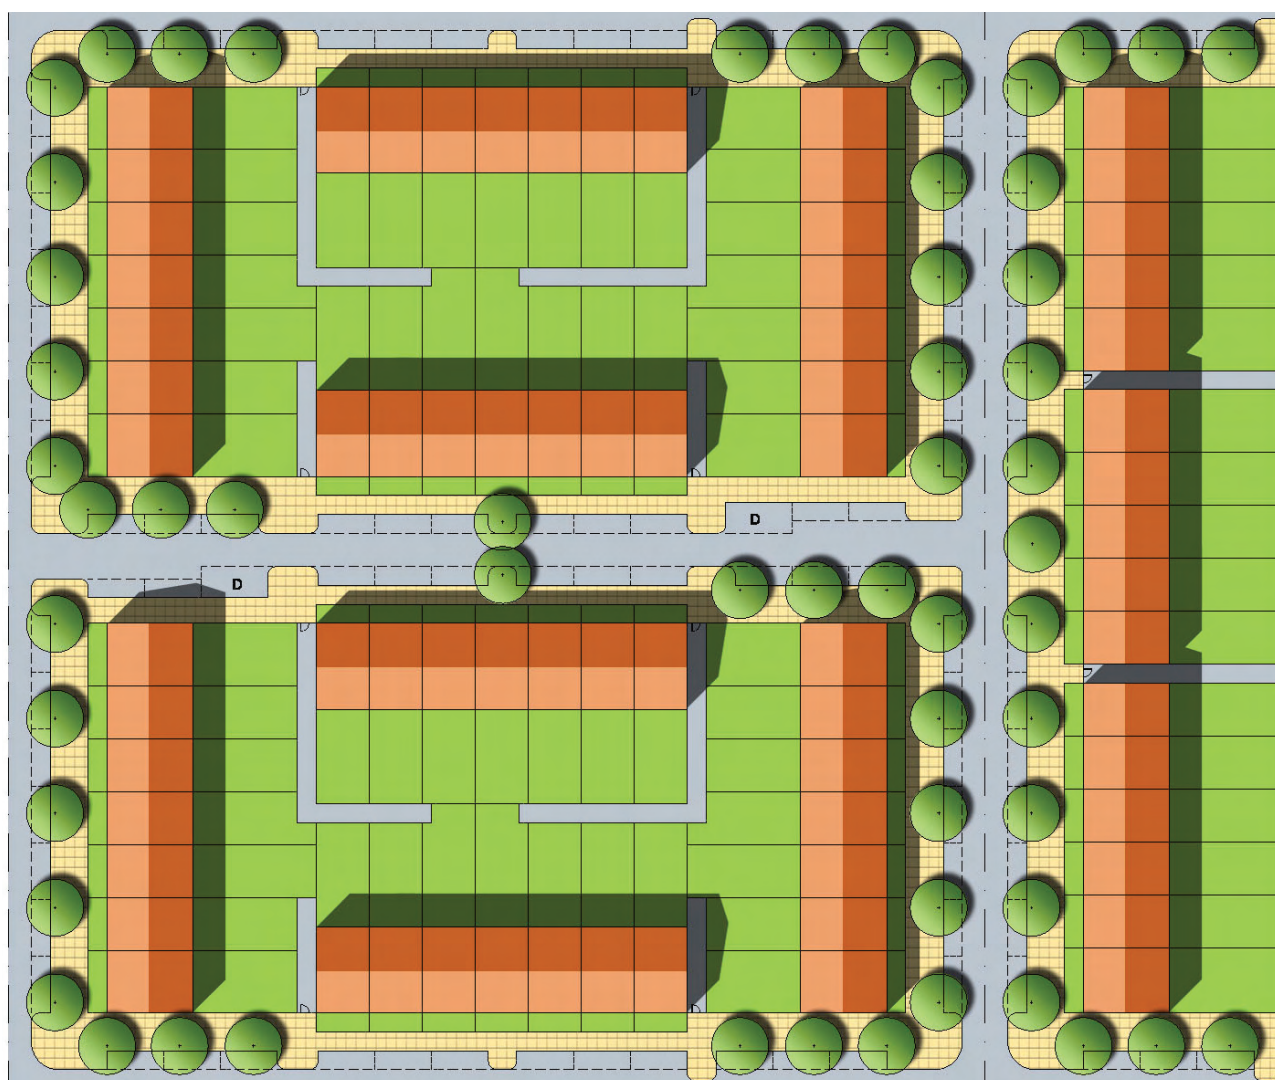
Traditional streets with parallel on-street parking as the main parking provision. Secondary streets are narrowed to 3.5m to slow traffic and create safe crossing points.
